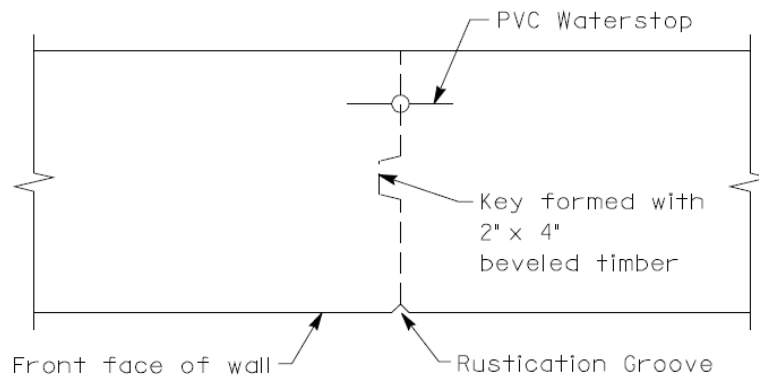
KYTC Wall Contraction Joint Detail (KYTC 2005)
